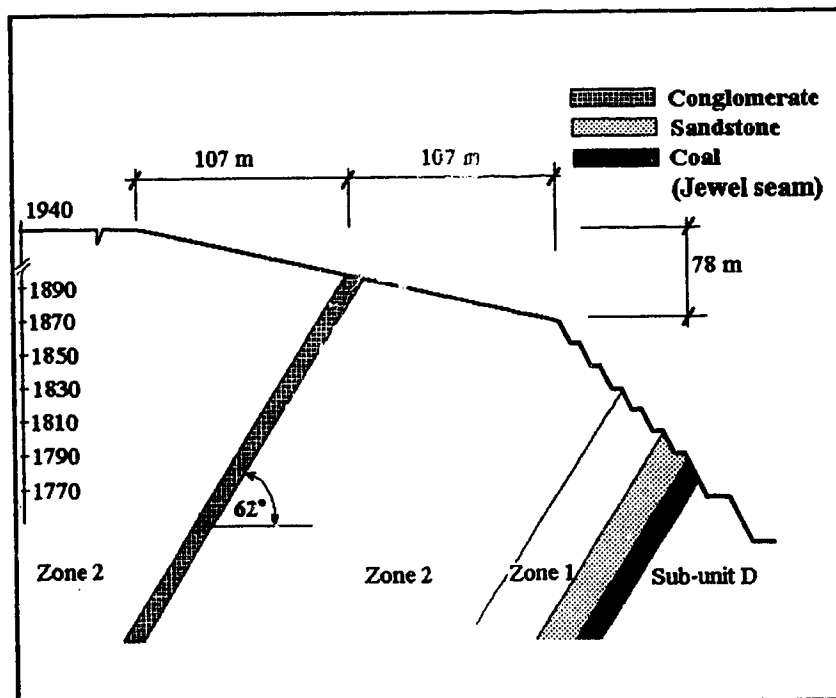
Cross-section through the highwall of the 50-A-5 pit
